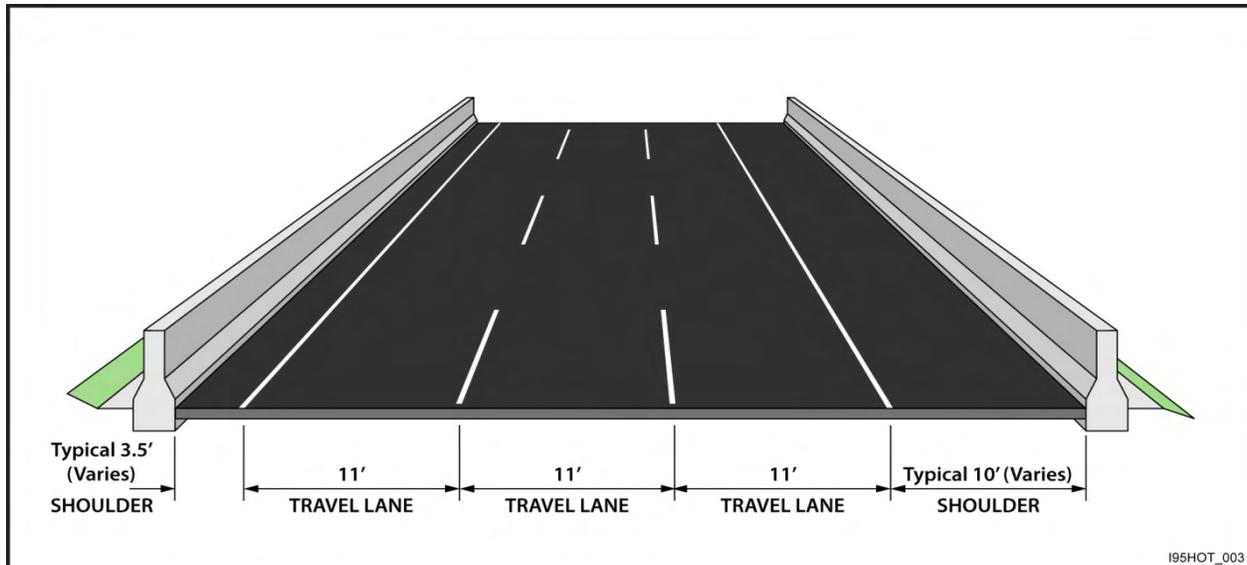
C. Typical Three-Lane Cross-Section – Existing Pavement
